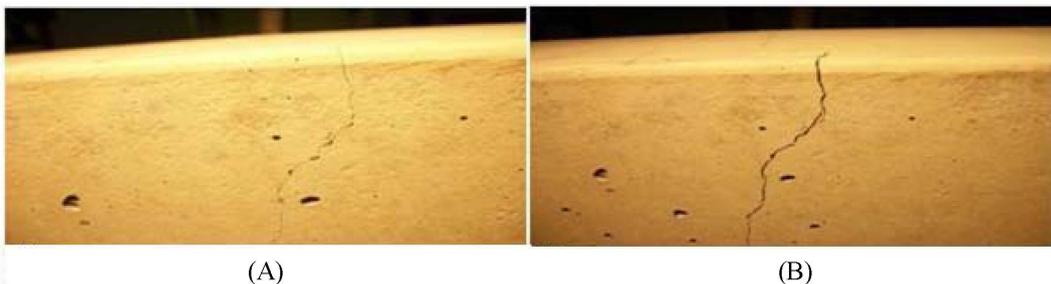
Crack patterns of sleepers (A) 0.18 mm width (B) 1.5 mm width
